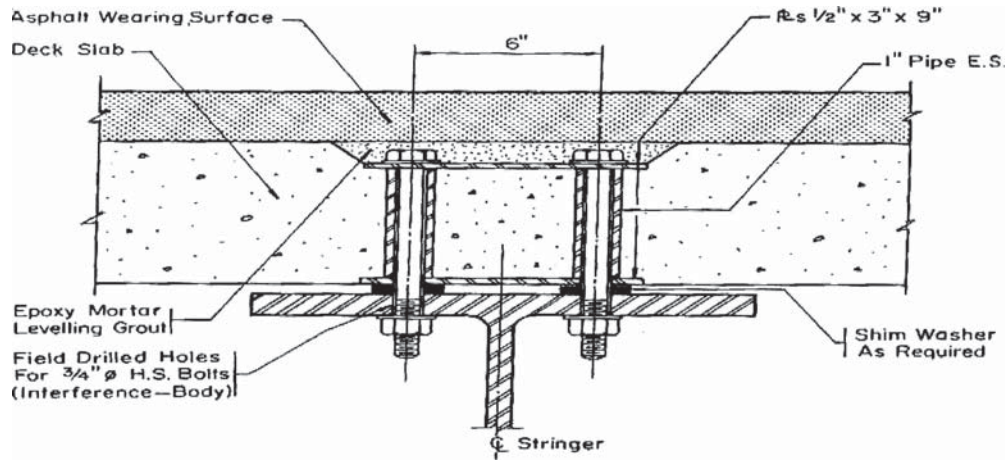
Bolted detail used in the New York Thruway experimental bridge.
